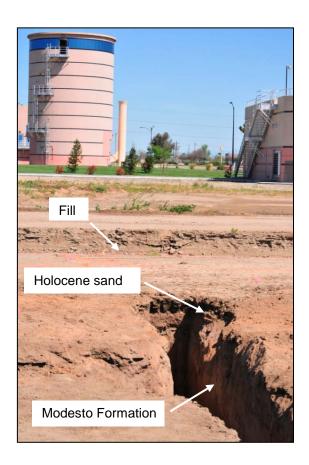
Soil trench, 350 feet south of Project site (see Figure 3), showing upper fill, Holocene sand and reddish soil of the Modesto Formation. Silo in background similar to one to be constructed.
